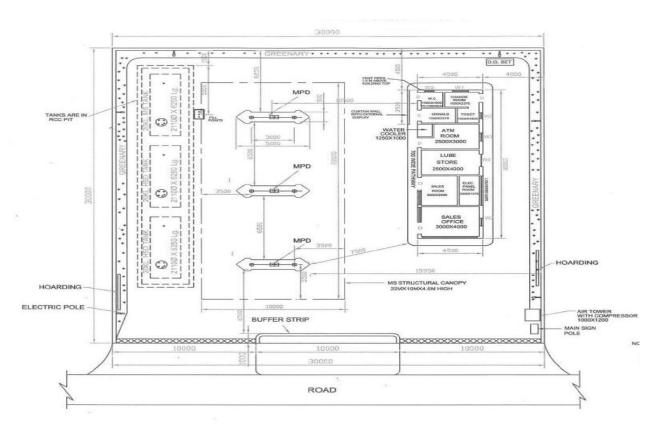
Layout of retail outlet type -2. This is the most common type
